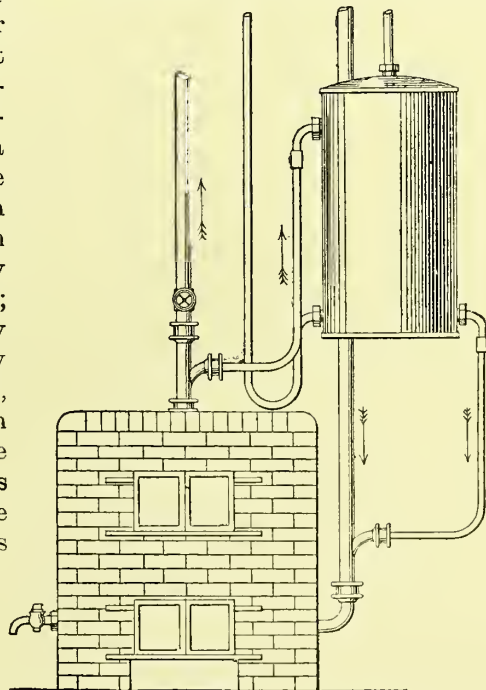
Connection of Cylinder to Arrangements in use for Heating the Building
